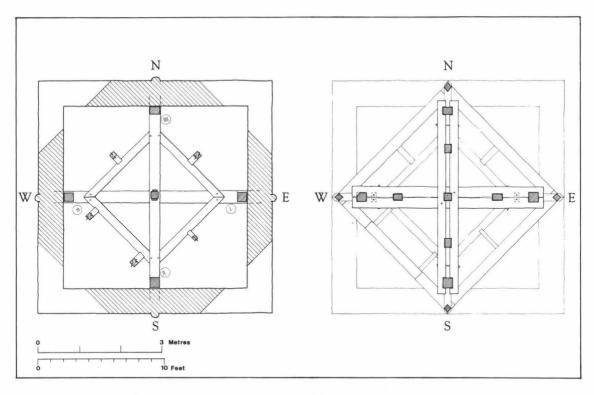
Left, plan showing base beams and horizontal braces. Right, plan showing the inserted paired beams just above plate
